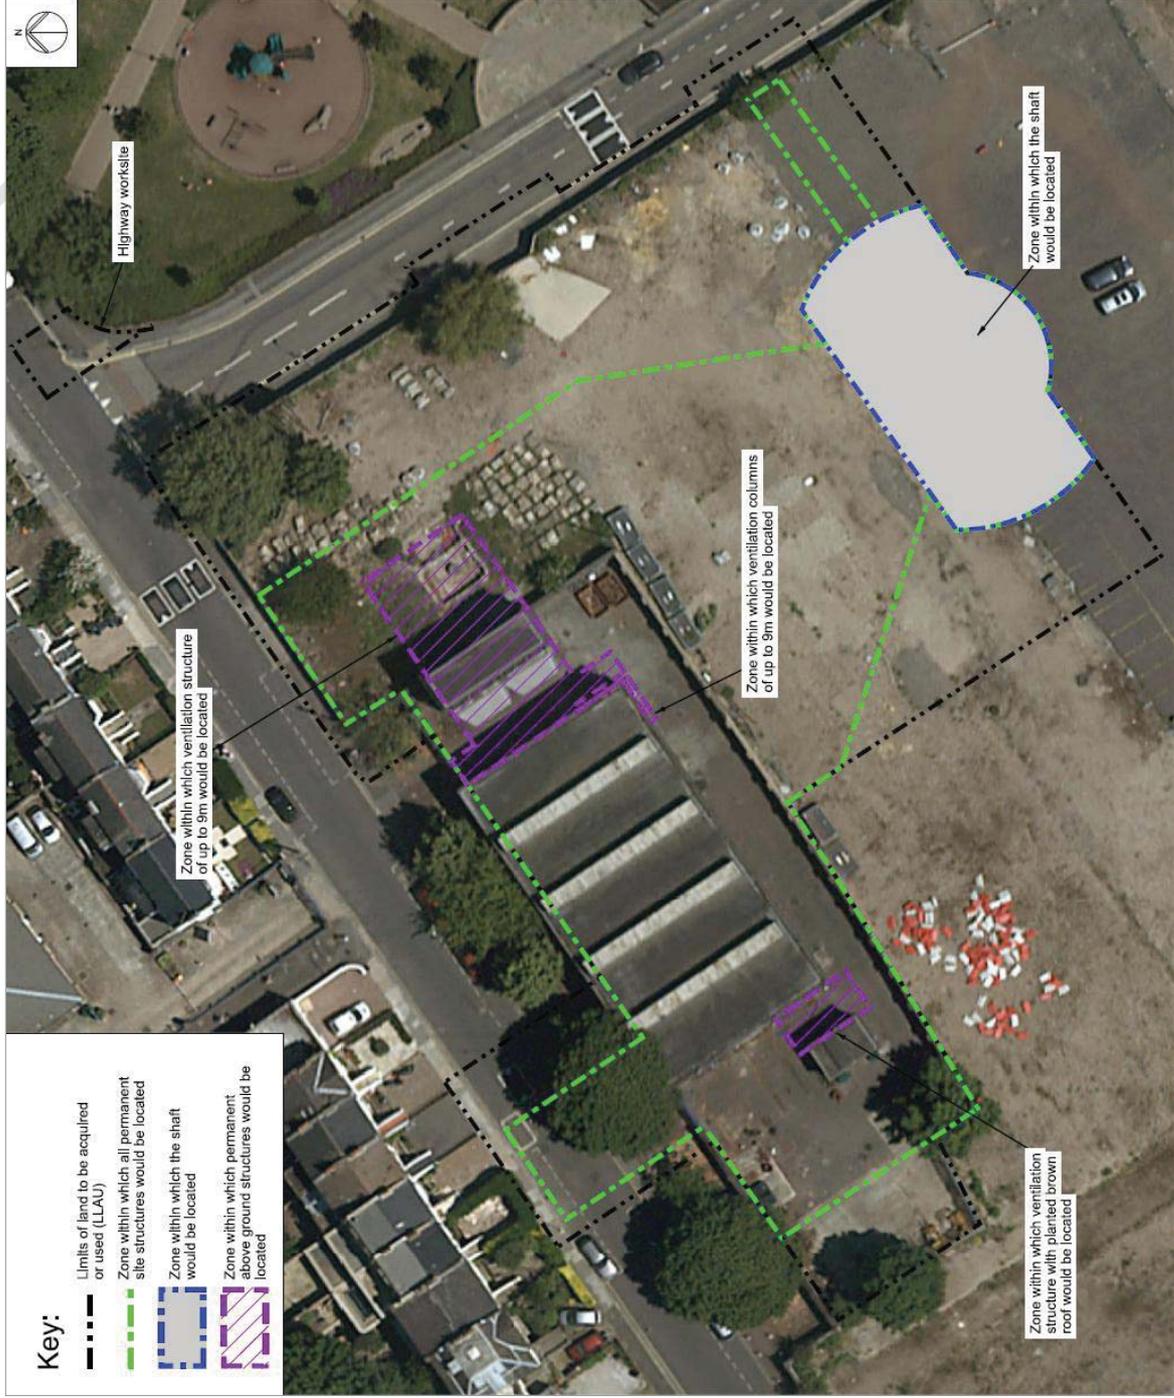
Schematic layout at Hammersmith Pumping Station site
